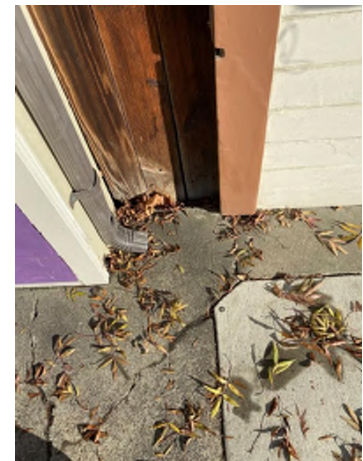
Example of a Nail and Tin set in concrete sidewalk.
